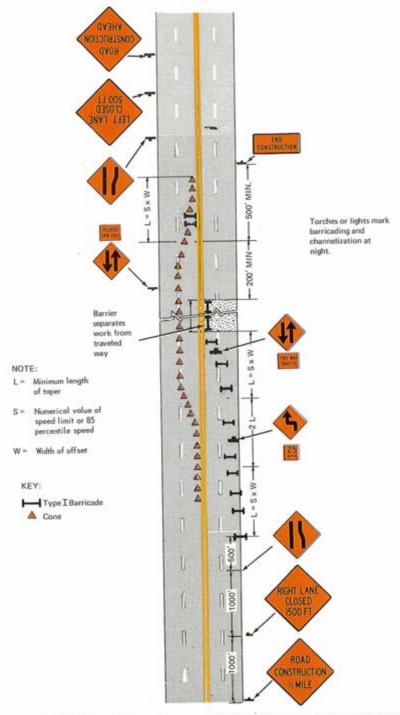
Typical application-4-lane undivided roadway where half the roadway is closed.
